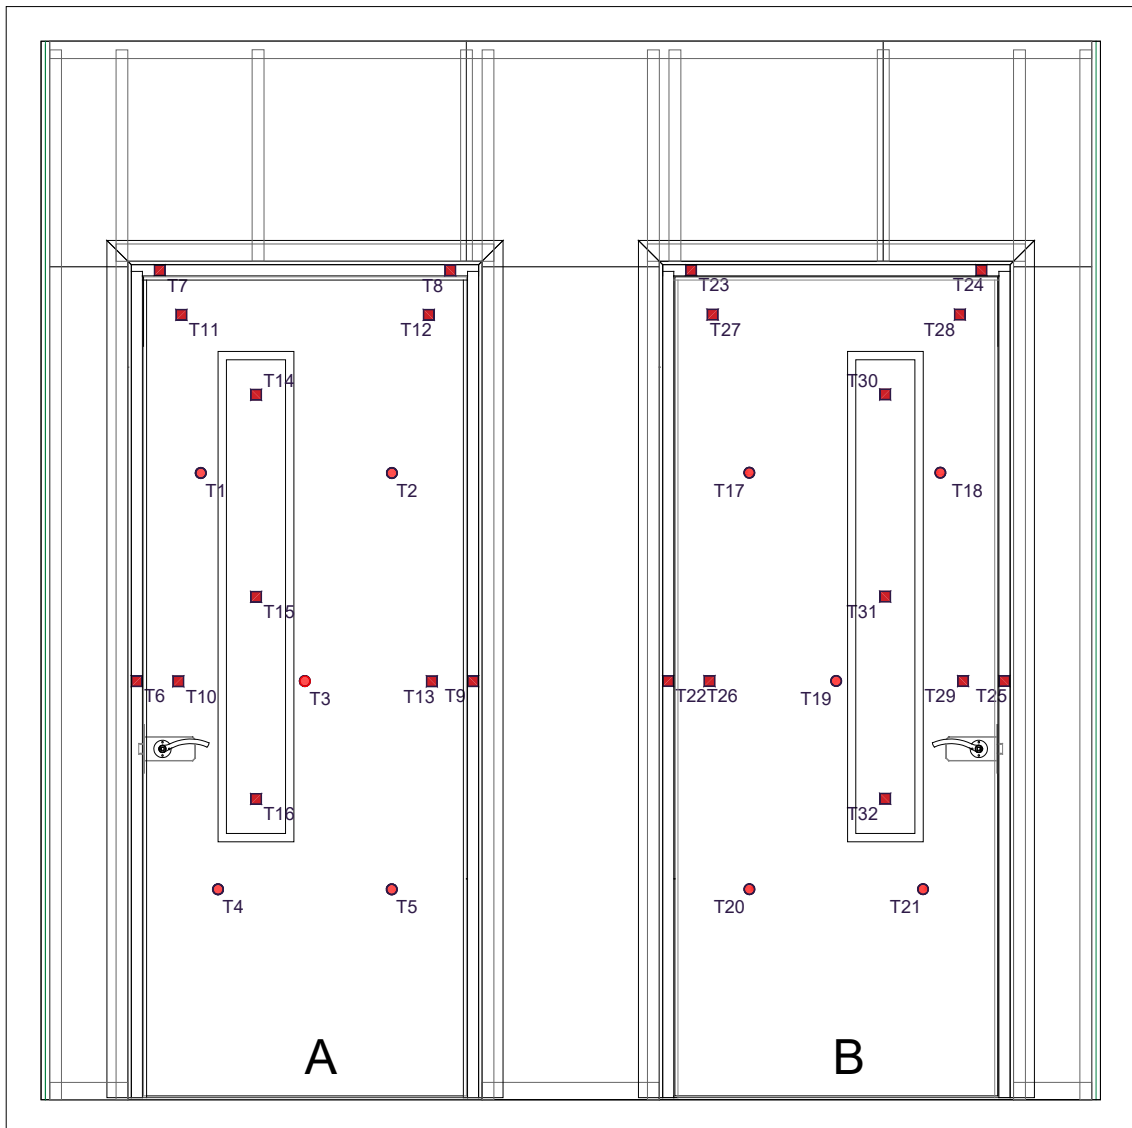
Layout of instrumentation viewed from the unexposed surface of the test construction
